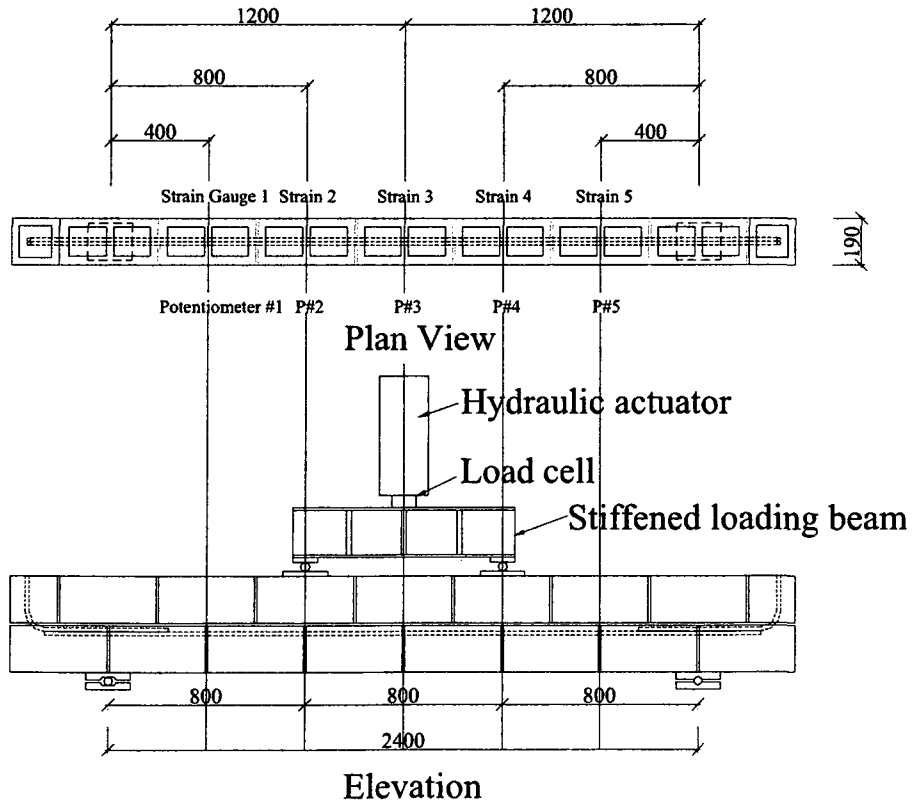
Elevation and plan view of two-course reinforced masonry specimens showing locations of strain gauges and potentiometers
